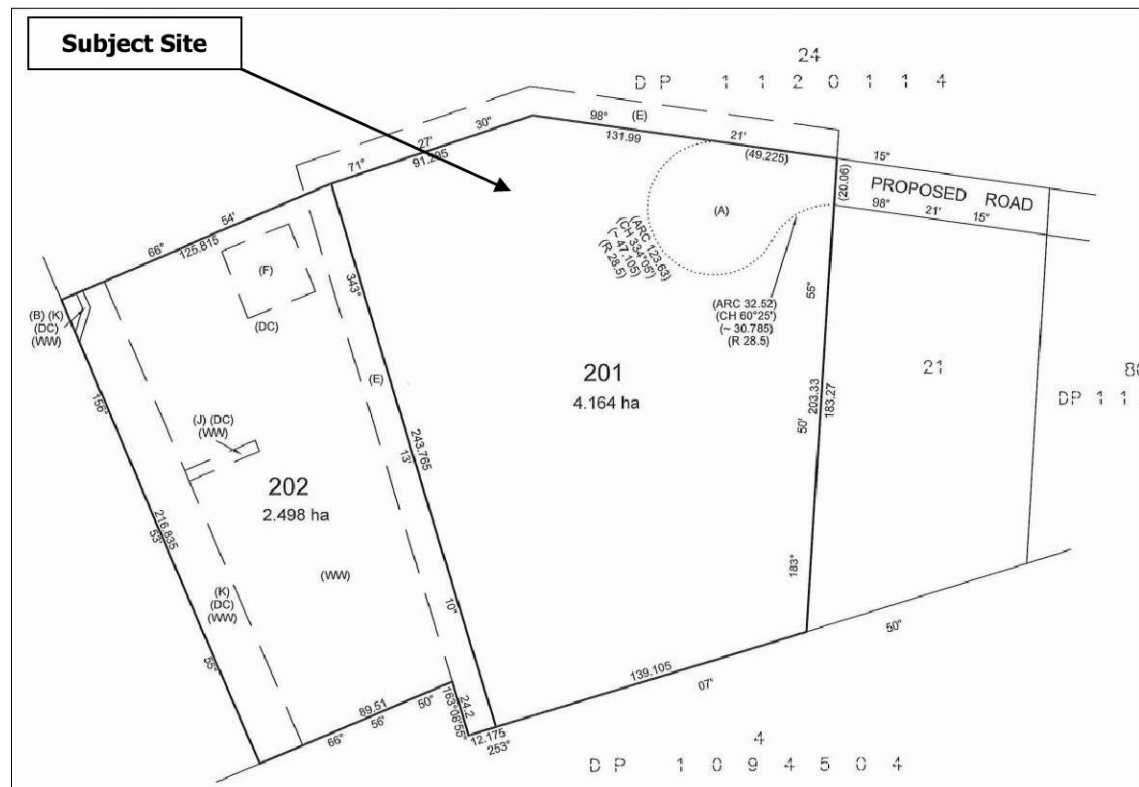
Plan of Subdivision (DA15/907) (Source: Chadwick Cheng, 2012)
